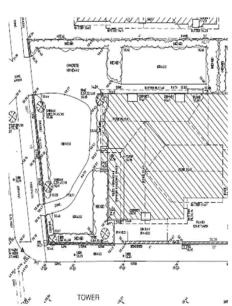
Existing front landscaped area. Source: Survey Plan Norton Survey Partners
